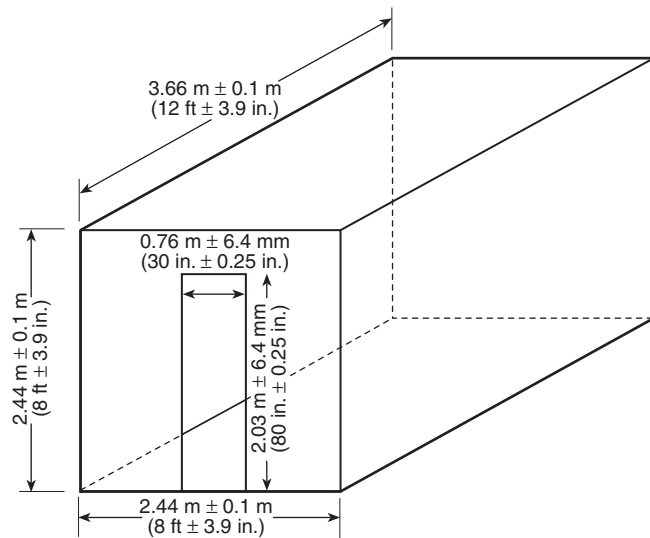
Interior Room Dimensions and Interior Doorway Dimensions.
